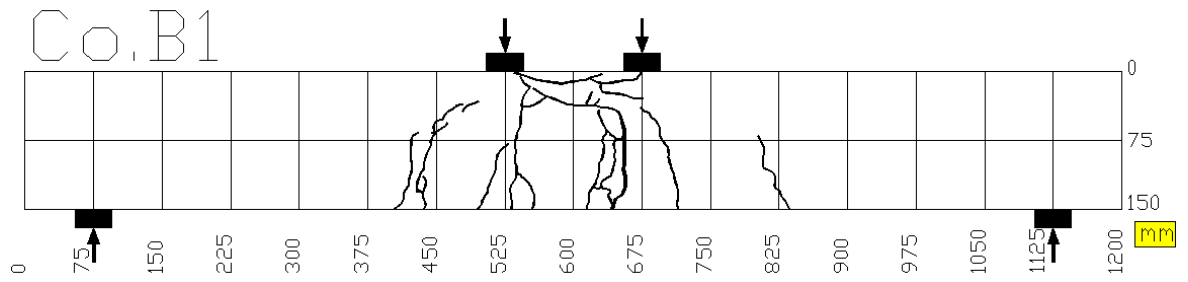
Crack Pattern for Beam (Co.B1) At Failure
